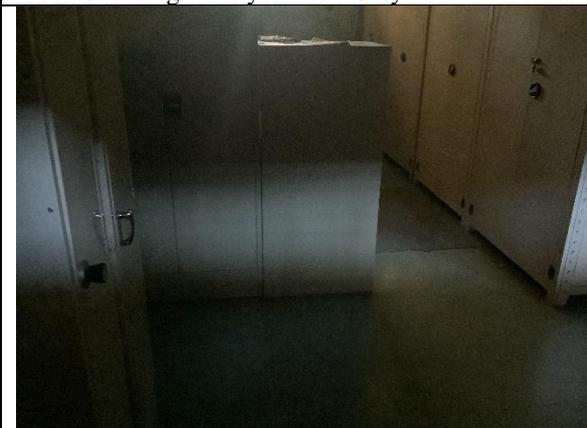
Building G – G.1.3 – Throughout – Floor Covering – Vinyl Tiles - Grey
